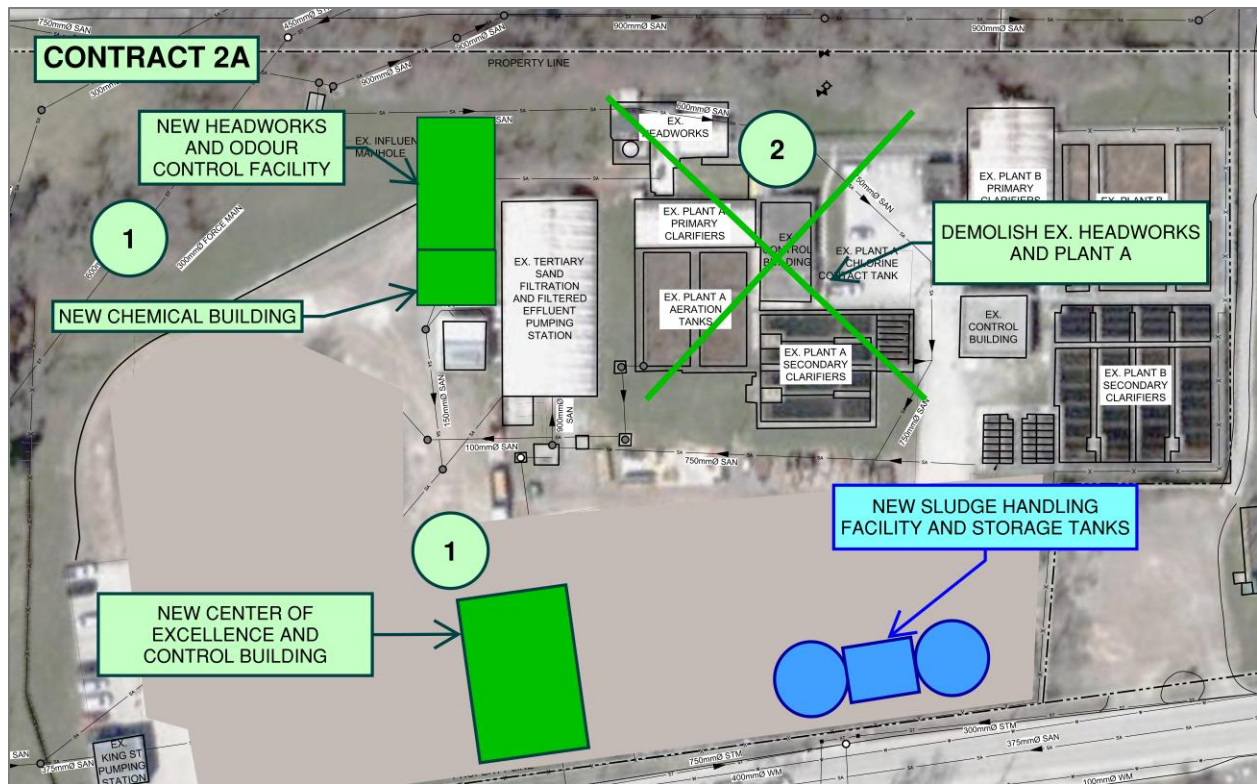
Site Layout A Implementation - Conceptual Contract 2A
